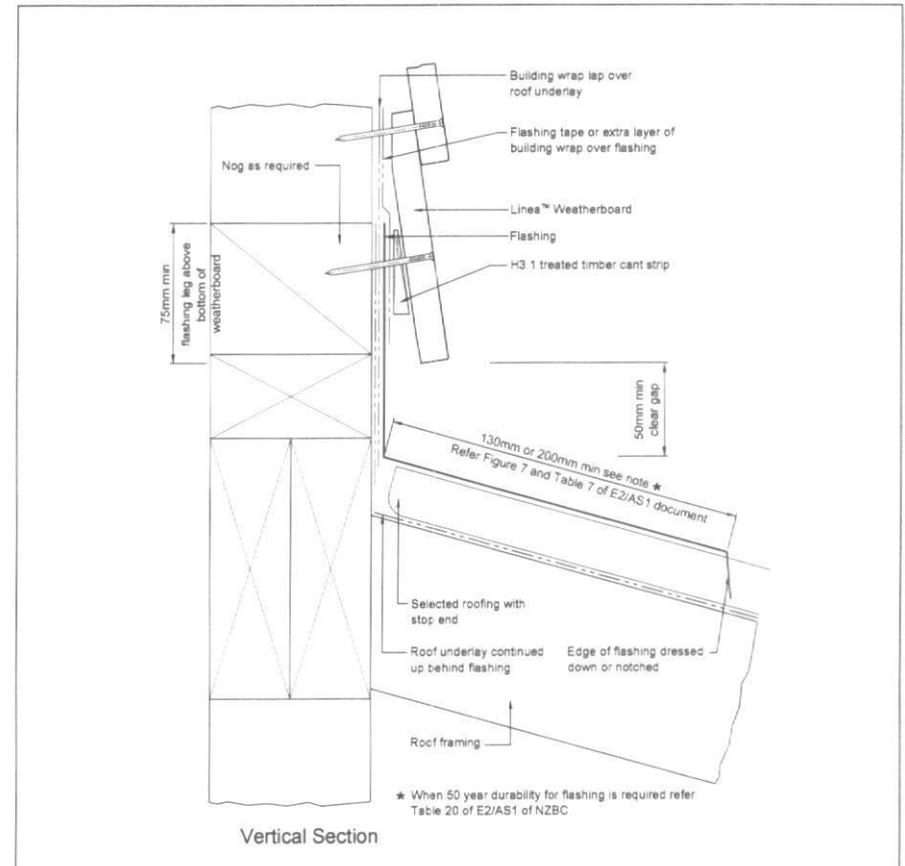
DIRECT FIX ONE PIECE APRON FLASHING JOINT
